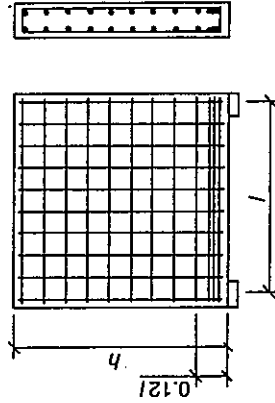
Distribution of longitudinal reinforcement in a deep beam in case of direct loading (schematic)
